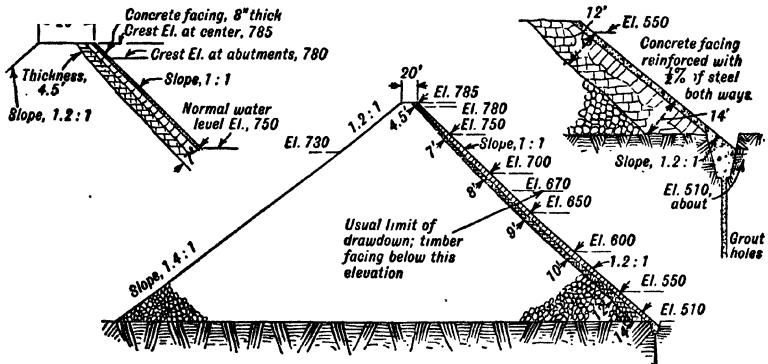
High Rock-fill Dam over Dix River—Rubble, Concrete and Timber Facing on Upstream Side.
